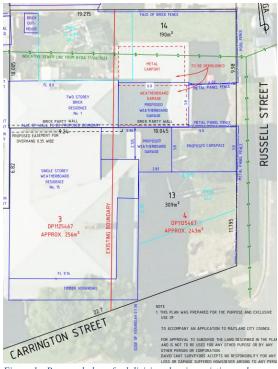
Proposed plan of subdivision showing existing and proposed boundaries with existing structures
